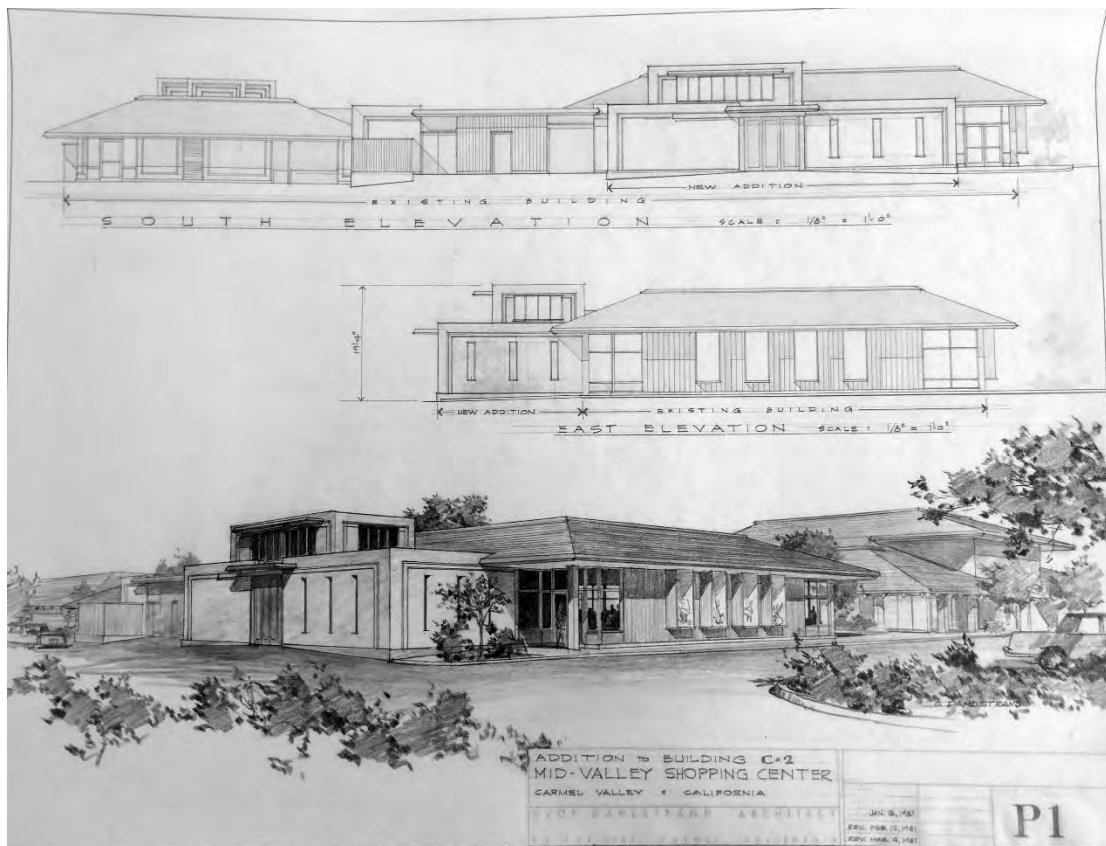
1981 elevation and perspective drawings by Olof Dahlstrand, depicting proposed addition to Building B. Perspective drawing looks north across southwest and southeast façades. Source: CED.
